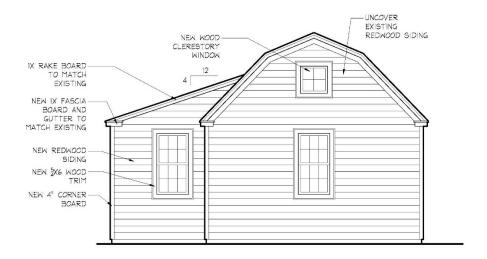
The proposed left side elevation proposes a new window in the gable end, an addition with a sash window, removal of the vinyl siding, and restoration and installation of redwood siding.
